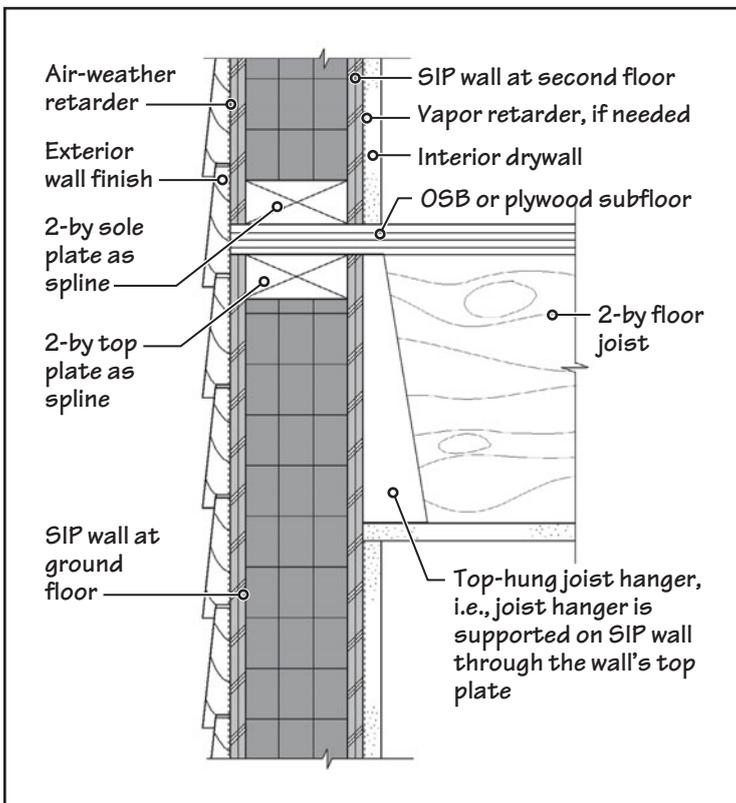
Detail at the intersection of a floor and a SIP wall—an alternative to the detail in Figure 17.11. In this detail, site-installed insulation is not needed.
